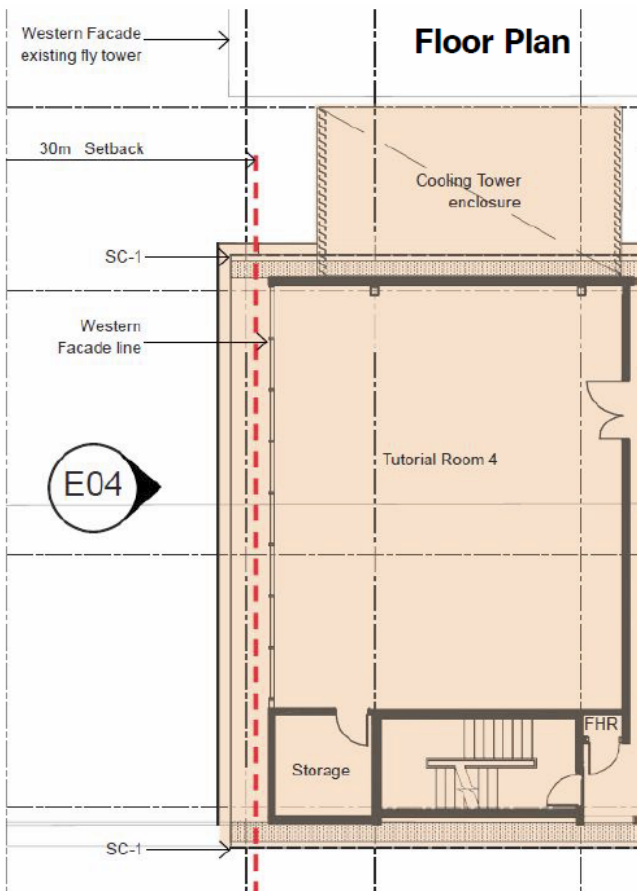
Floor Plan Showing 750mm encroachment into 12m Height Zone (Source JBA)
